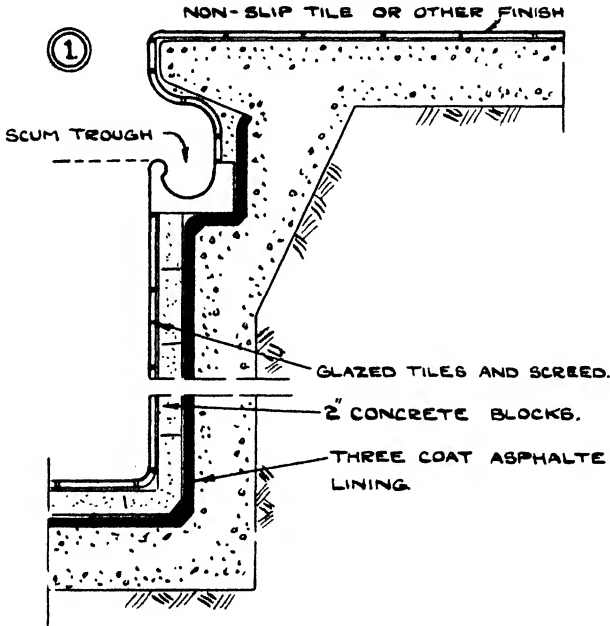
POOL WITH 2-IN. CONCRETE BLOCKS USED AS A PROTECTION OVER THE ASPHALTE
